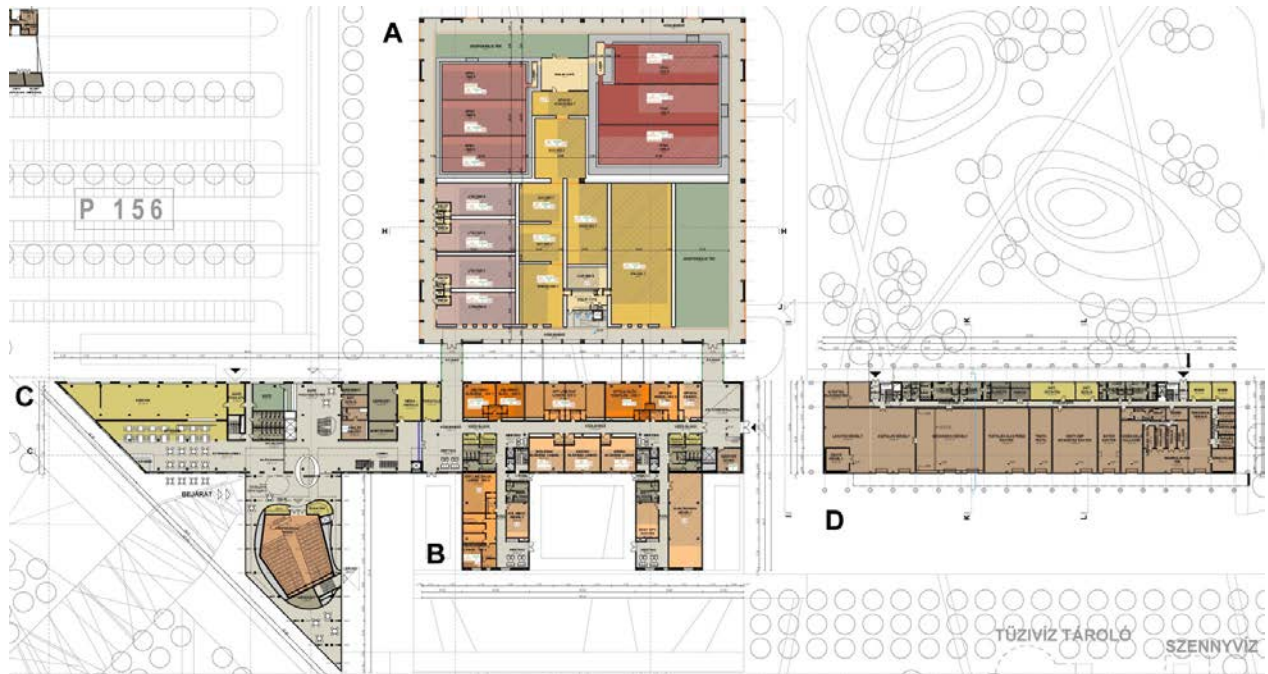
Ground floor layout of the buildings (by ARTONIC Kft., 2012)
